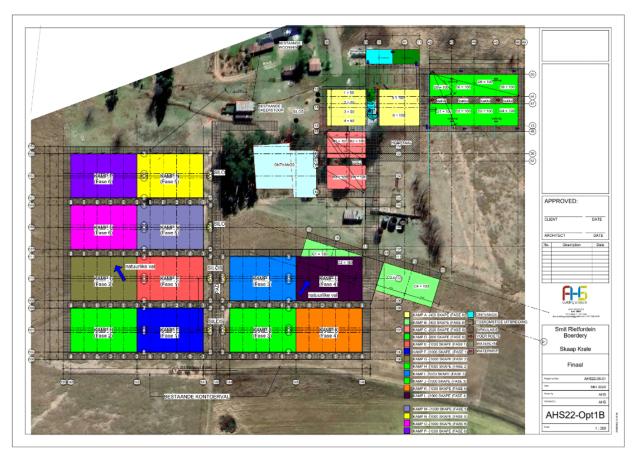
Layout plan indicating site boundary, plant boundary and internal roads – Option 1
